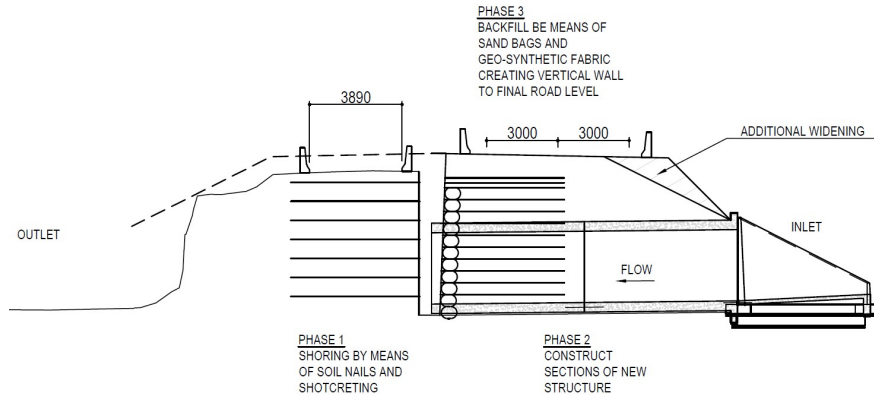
Construction Stage 1: Single Lane Stop-Go measures for existing road on left hand side indicating new culvert construction with dual traffic adopting geo-synthetic wrapping to final road level on the right hand side with minor additional widening.
